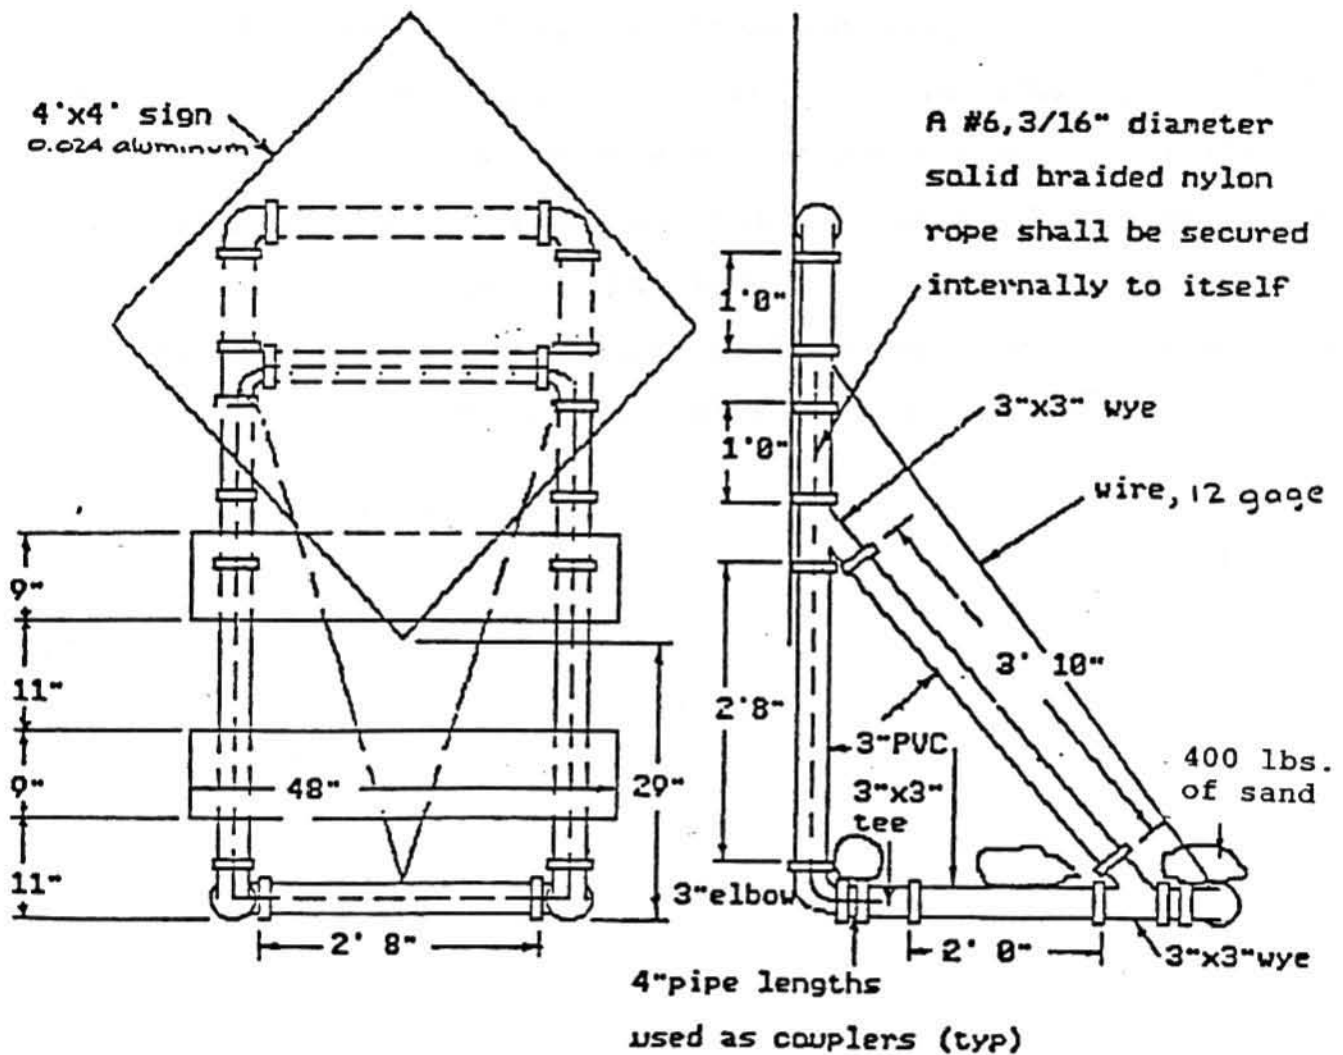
Breakaway Barricade For Test No. 3 and Test No. 4
